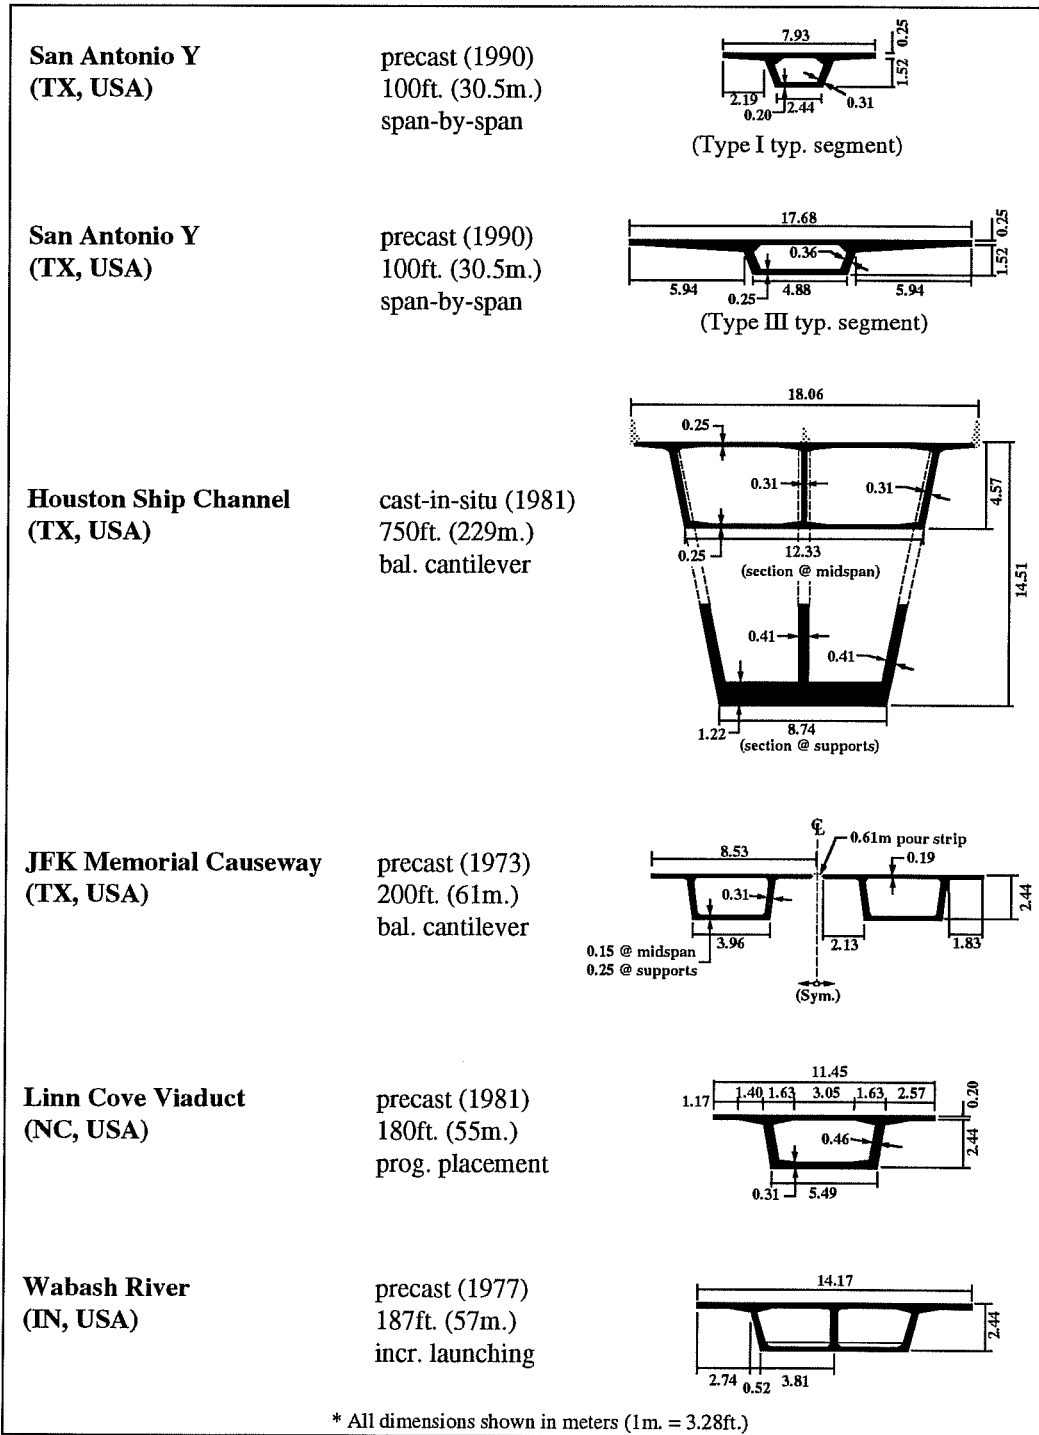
Cross-section geometry of typical concrete segments in the US.
